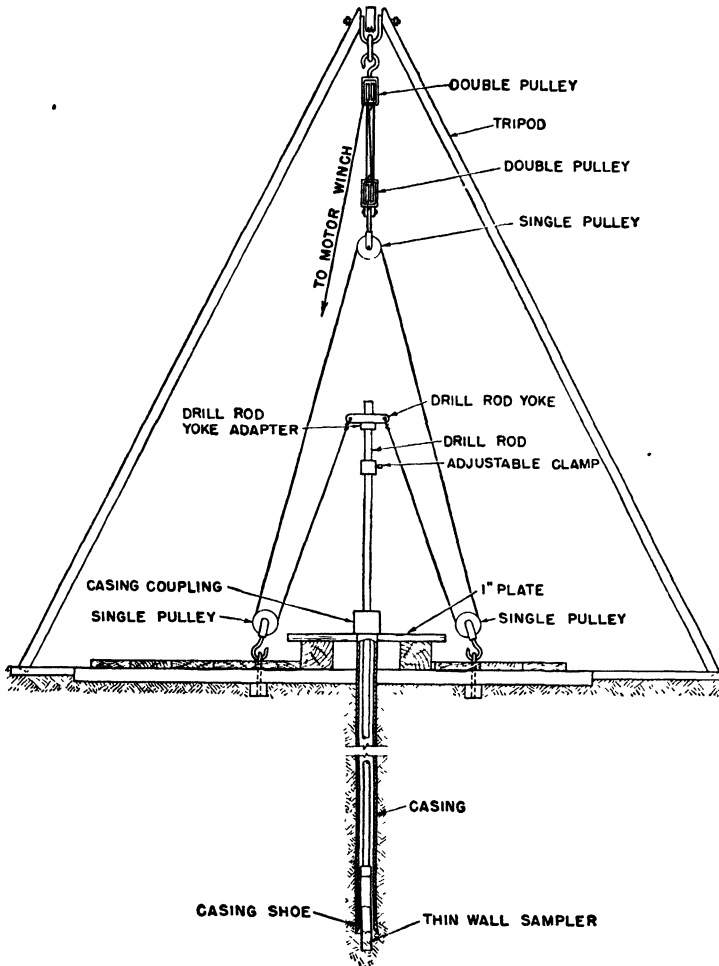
For undisturbed sampling the samplers should be pressed, not driven, into the soil. (Courtesy of Sprague & Henwood, Inc., Ref. 324.)
